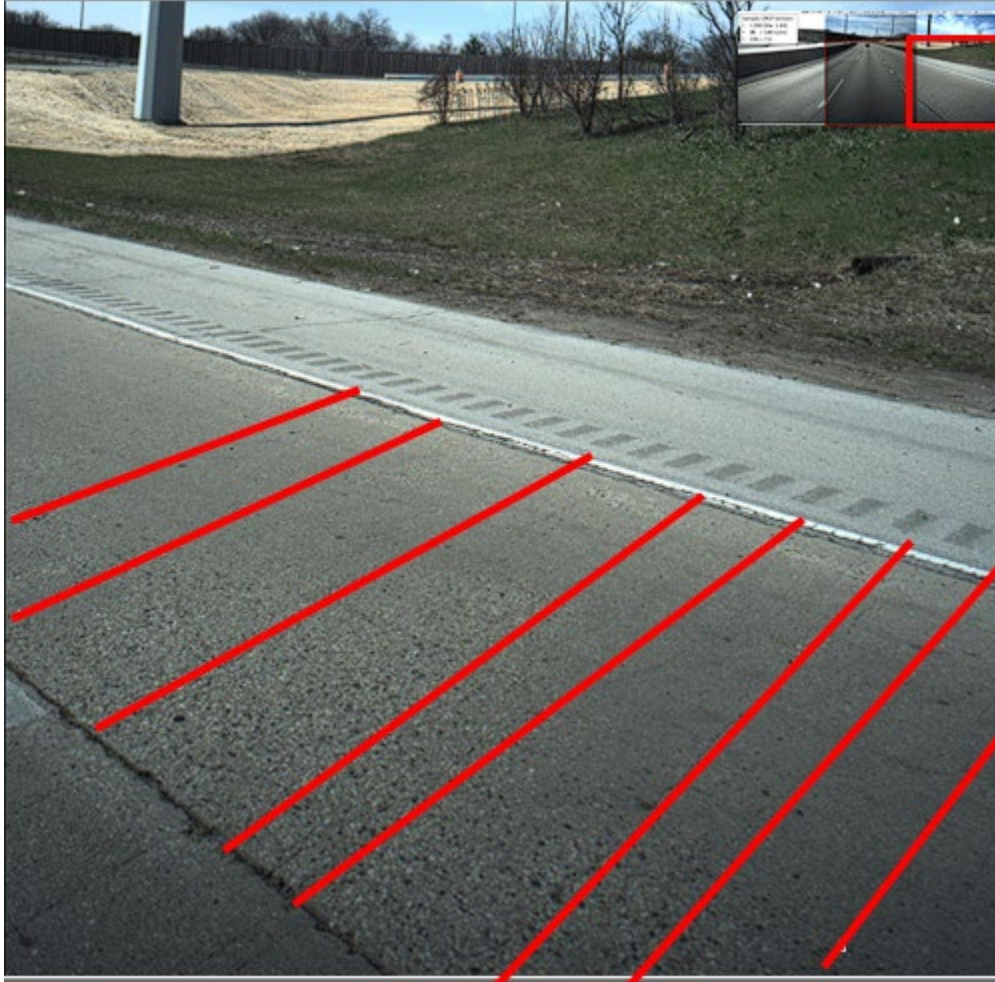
Image. IROADS image of highlighted transverse cracks in right driving lane with light pole, pavement stripes, and shoulder grooves.
